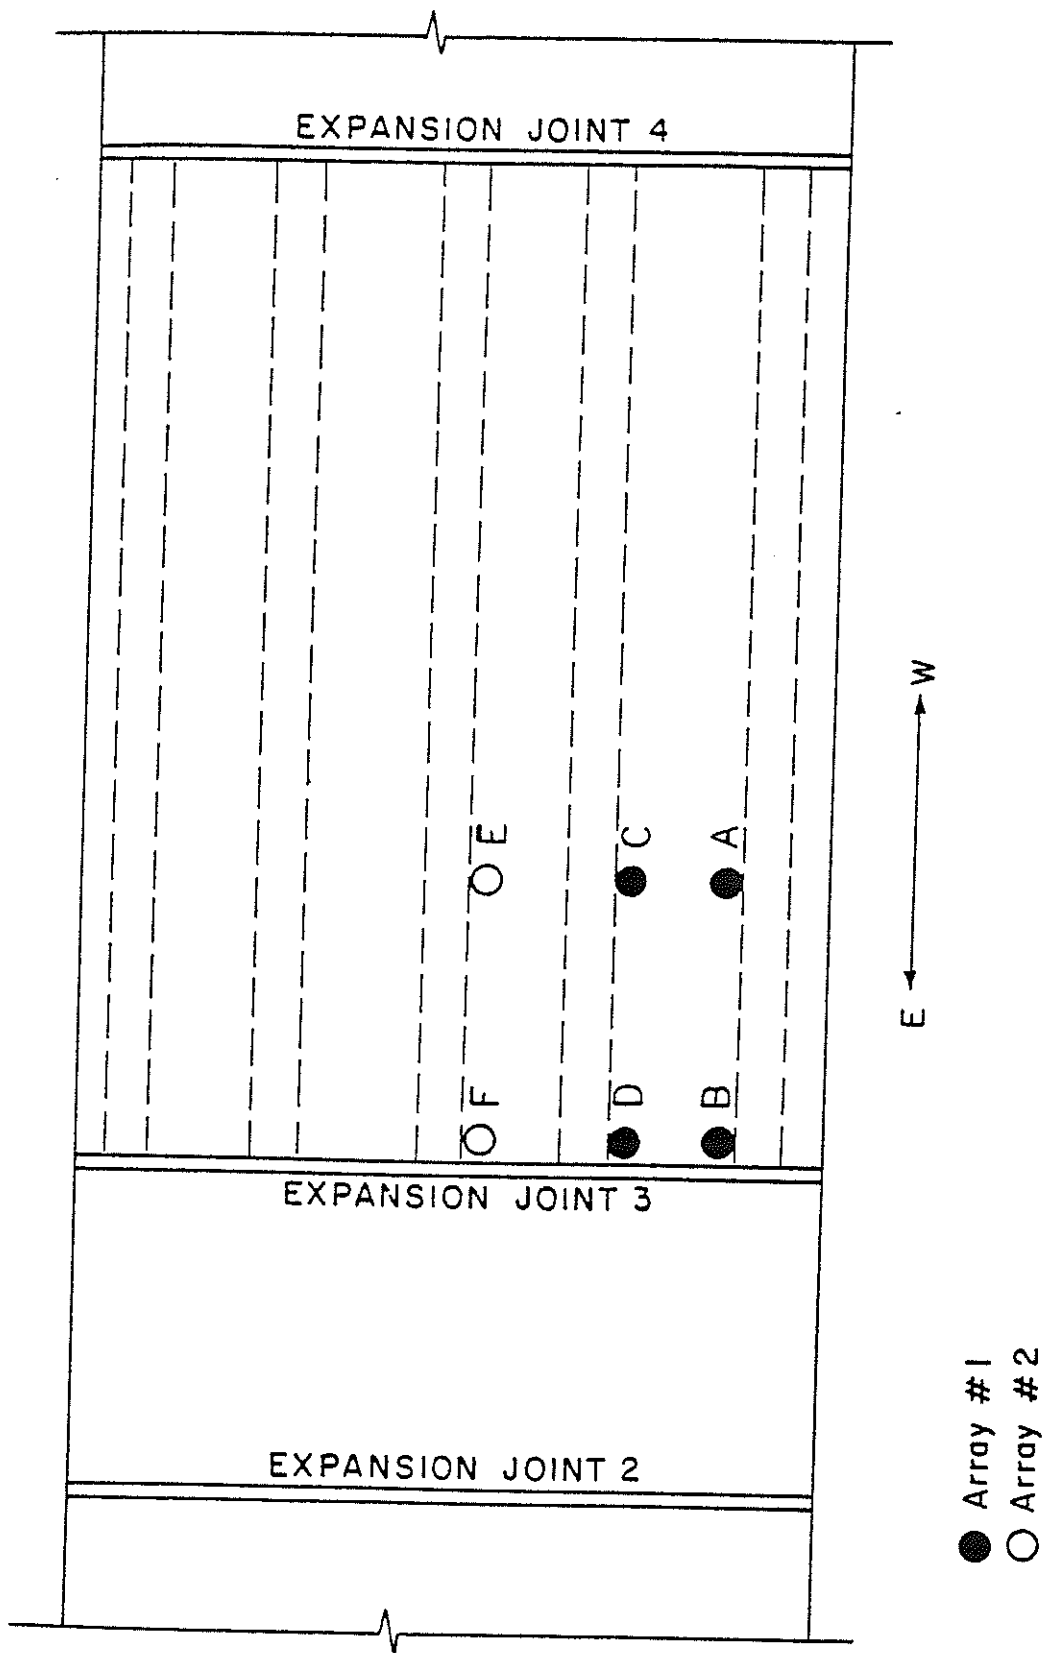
Plan View of Bridge Showing Location of Thermocouple Arrays.
